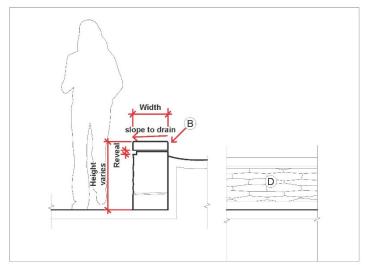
Landscape wall type 1 section and elevation
